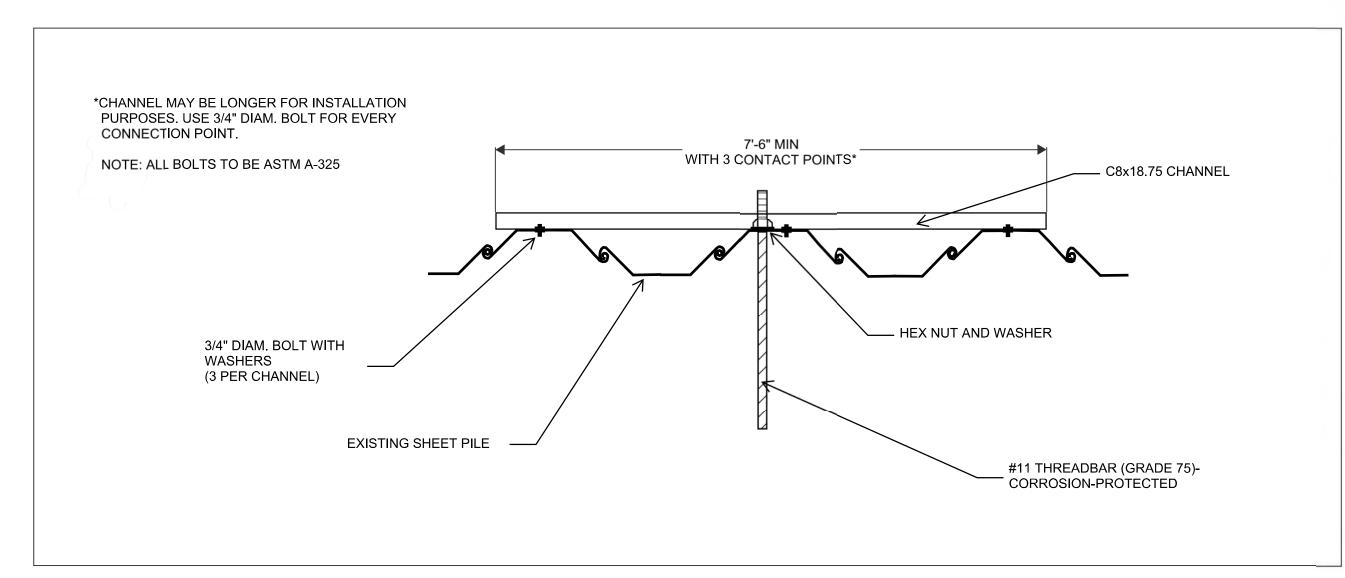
PLAN - SHEETPILE/TIE CONNECTION
